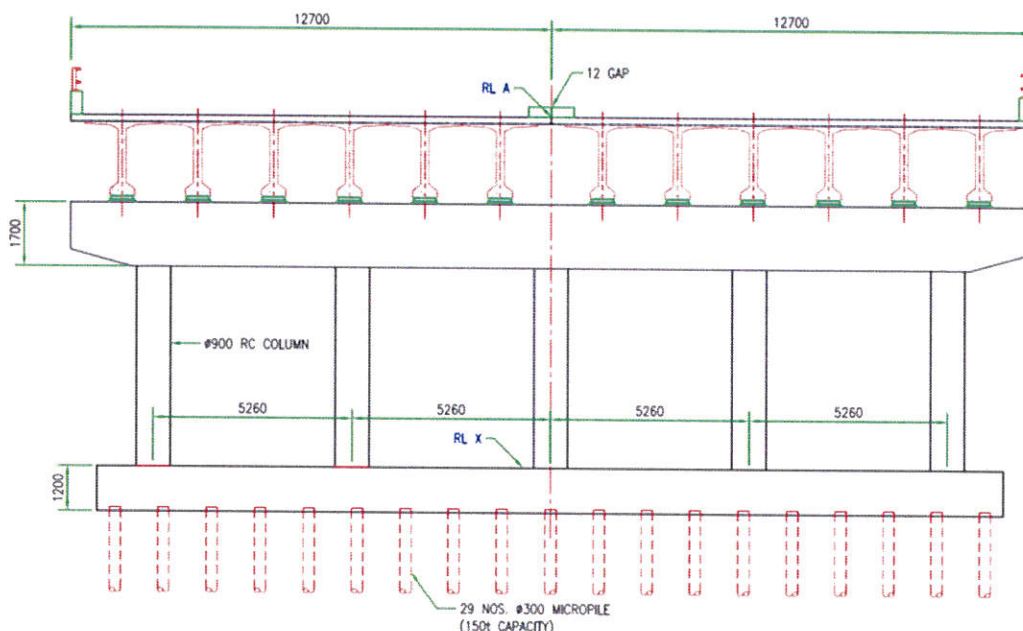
Typical multi-column pier for piers P1 to P4 and P20 to 23
